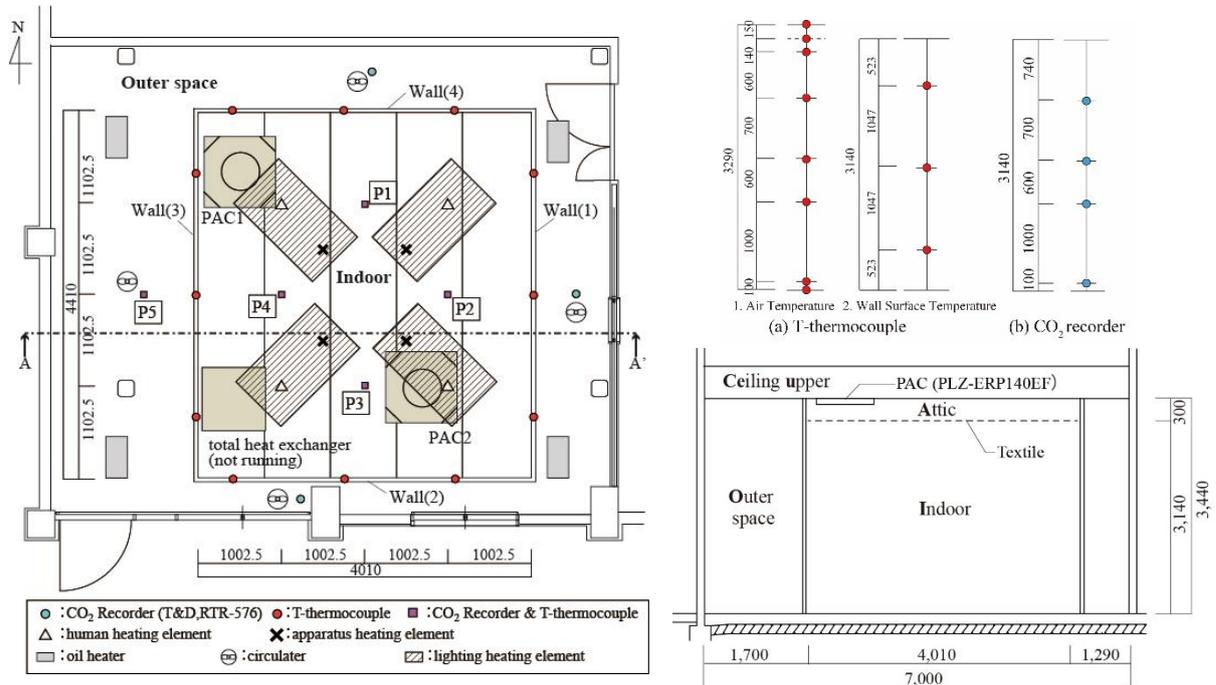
Plan of Experiment Room and A-A' Elevation and Measurement Points
